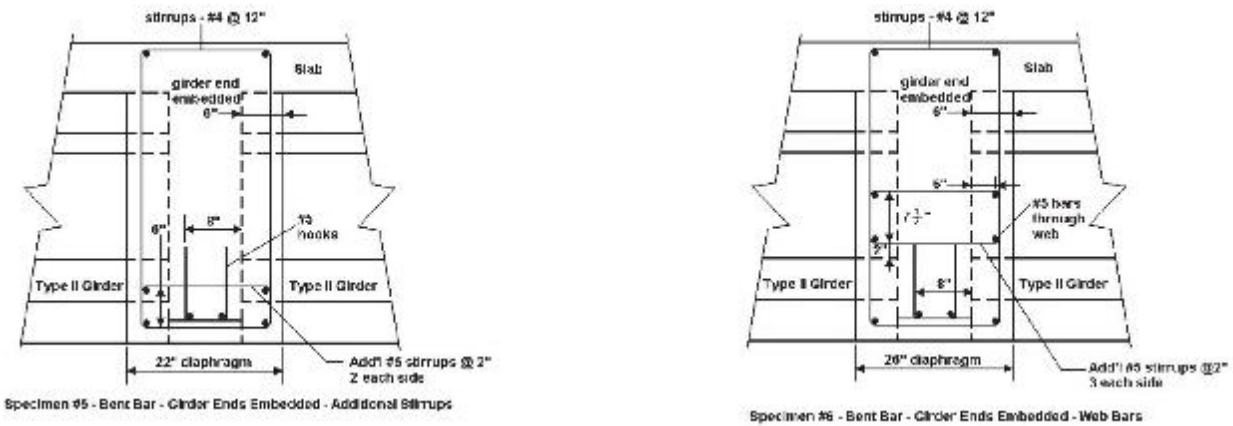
Details of the specimen #5 and #6 connection (Miller 2004).
